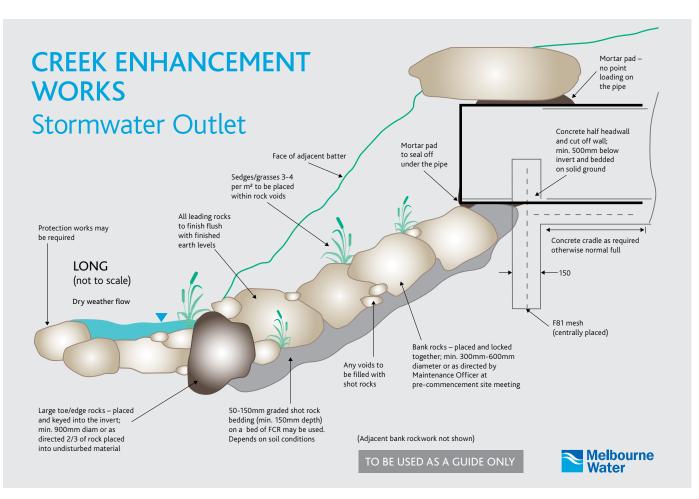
Stormwater outlet design. (Note that this figure is to be used as a guide only as the size of the rock and extent of the rock beaching will depend on pipe size, creek profile and expected discharge from the outlet.)
